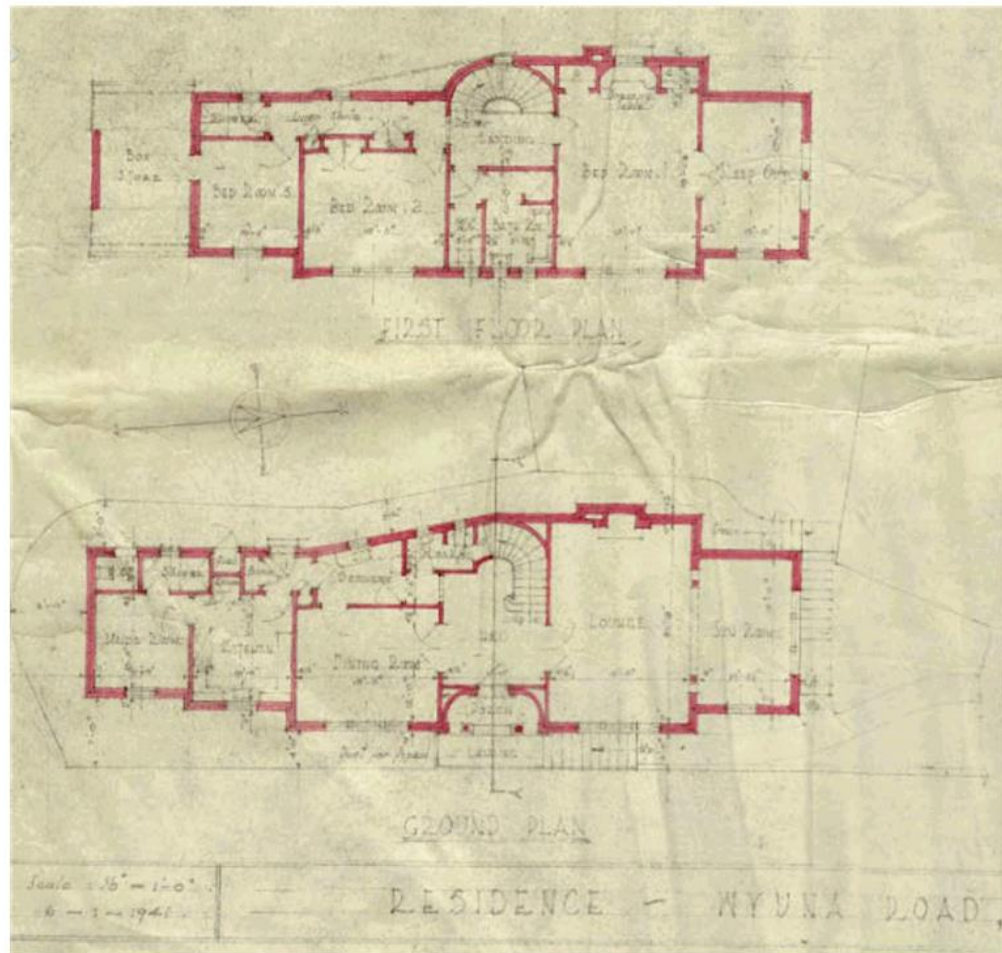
1941 plan of proposed dwelling house at 30 Wyuna Road, Point Piper (Source: WMC)
